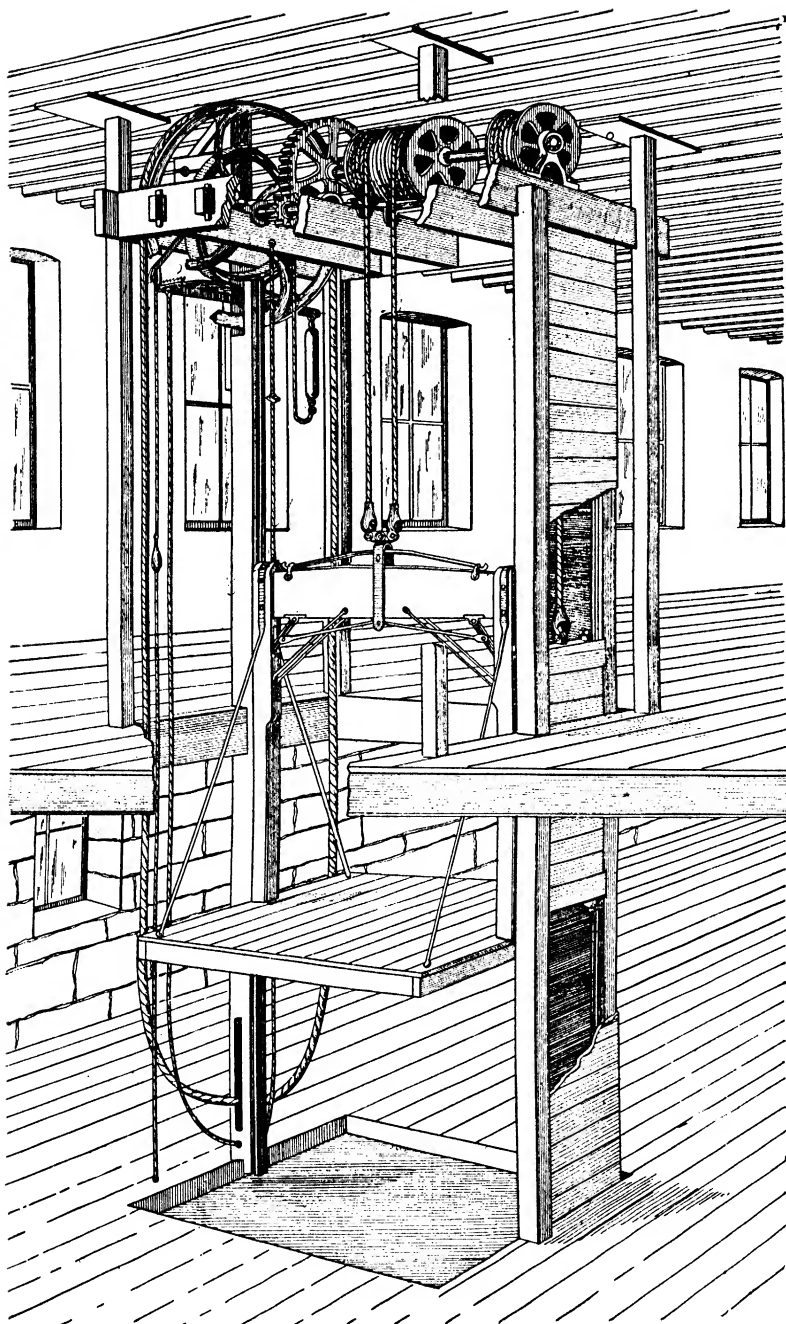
Detail Views of Center-Lift Elevator with Grooved Drums and Wire Ropes
